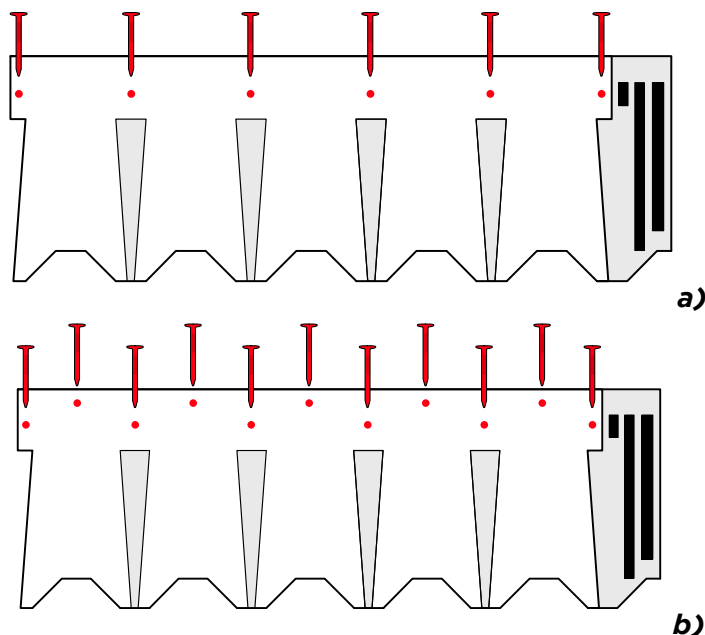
Shingle nailing a) slopes <60°; b) slopes >60°
